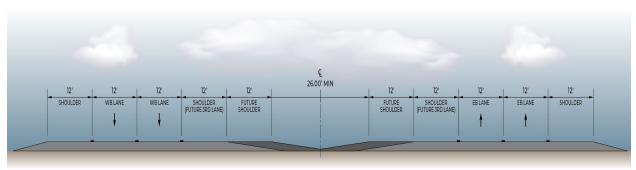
Typical Section 3: Enhanced 2-Lane Alternative with Depressed Median, Future 3-Lane Widening to the Inside of I-40, No CWB
